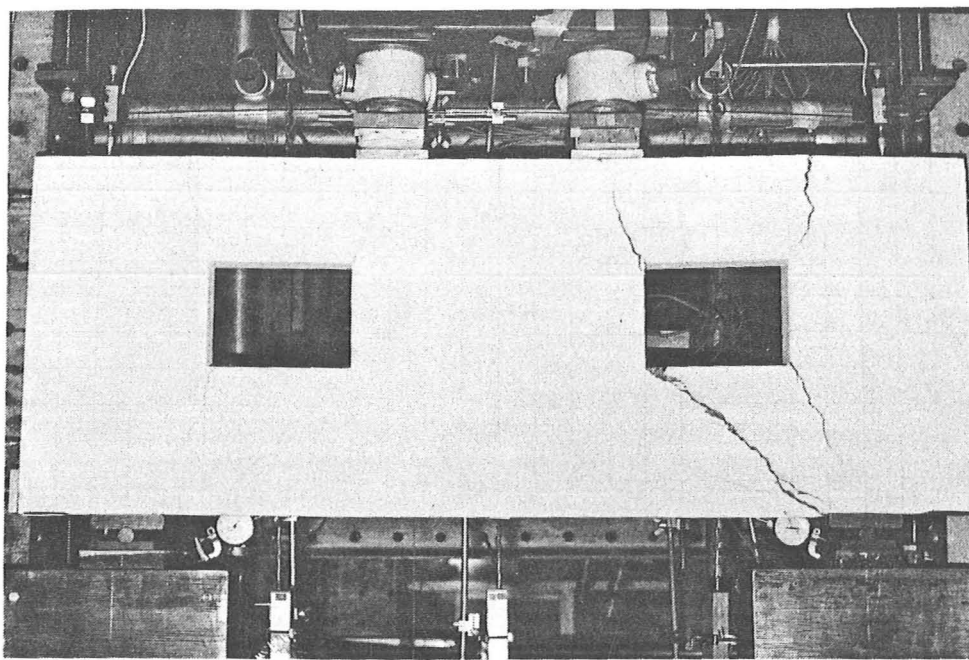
(a) Typical failure of beams with web opening and long overhang:
